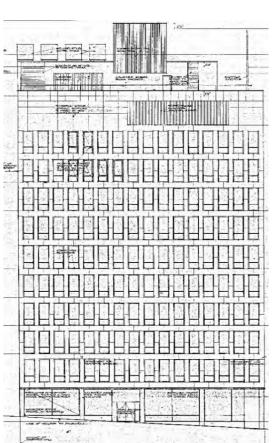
South elevation, fronting Collins Street. Drawings by Bates Smart & McCutcheon, dated 1960 (BAP).
